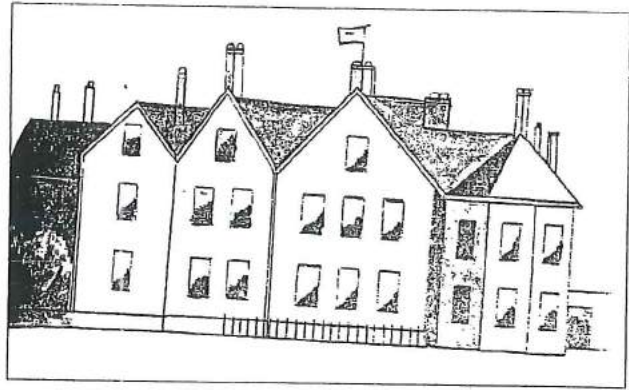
Winstanley Hall, west elevation c 1800 (Banks nd, part III).
